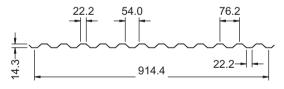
Corrugated sheet steel profile- Verco Decking SV36 (unit mm).
